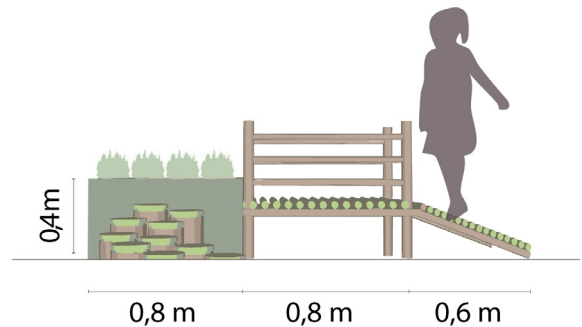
Section of the Play Planter (Van de Wetering, 2025).
